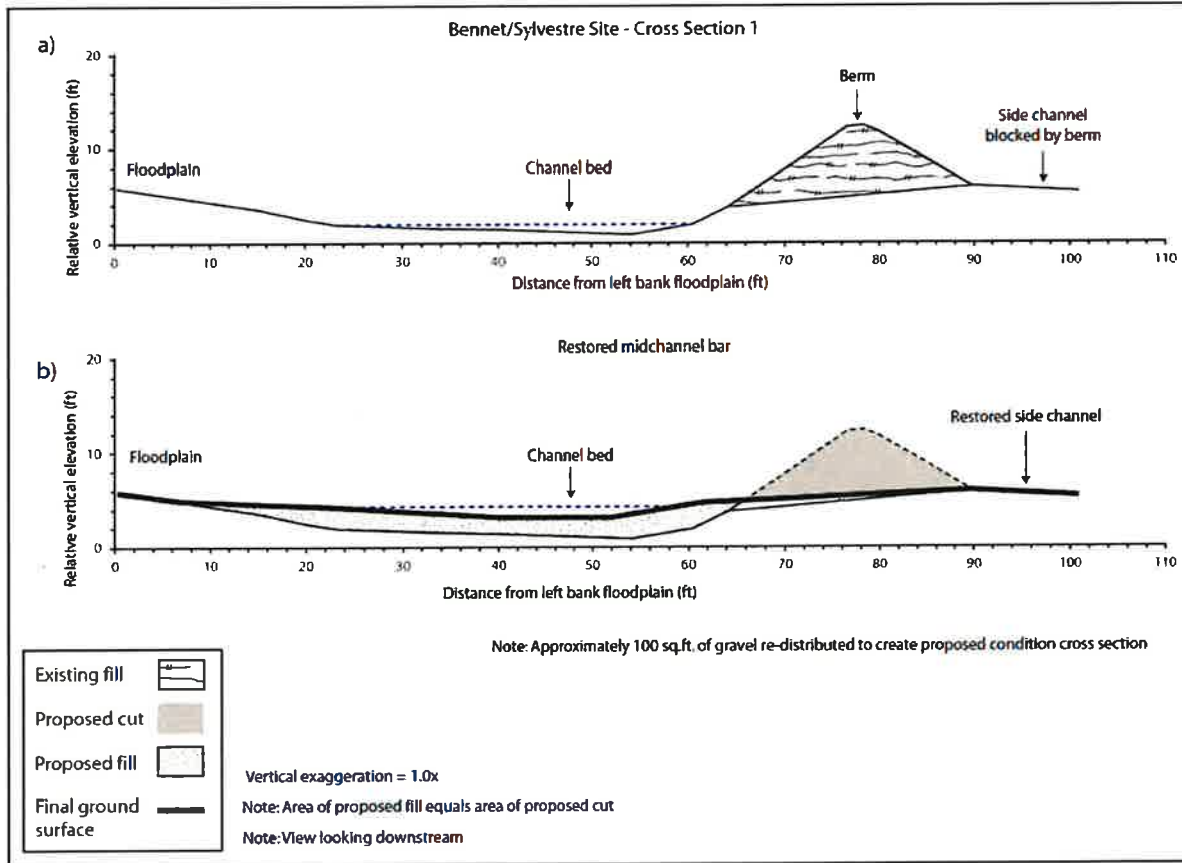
An example from the Bennett Site of how topographic cross sections were used to show the redistribution of berm material in the channel. Similar cross sections for all sites available in Appendix 1.
